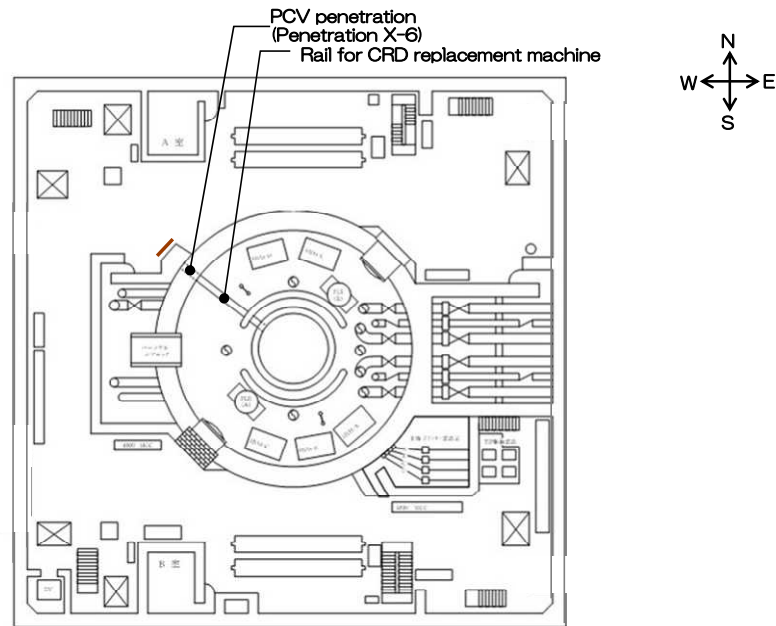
Layout on the ground floor of Unit-2 R/B [19]
